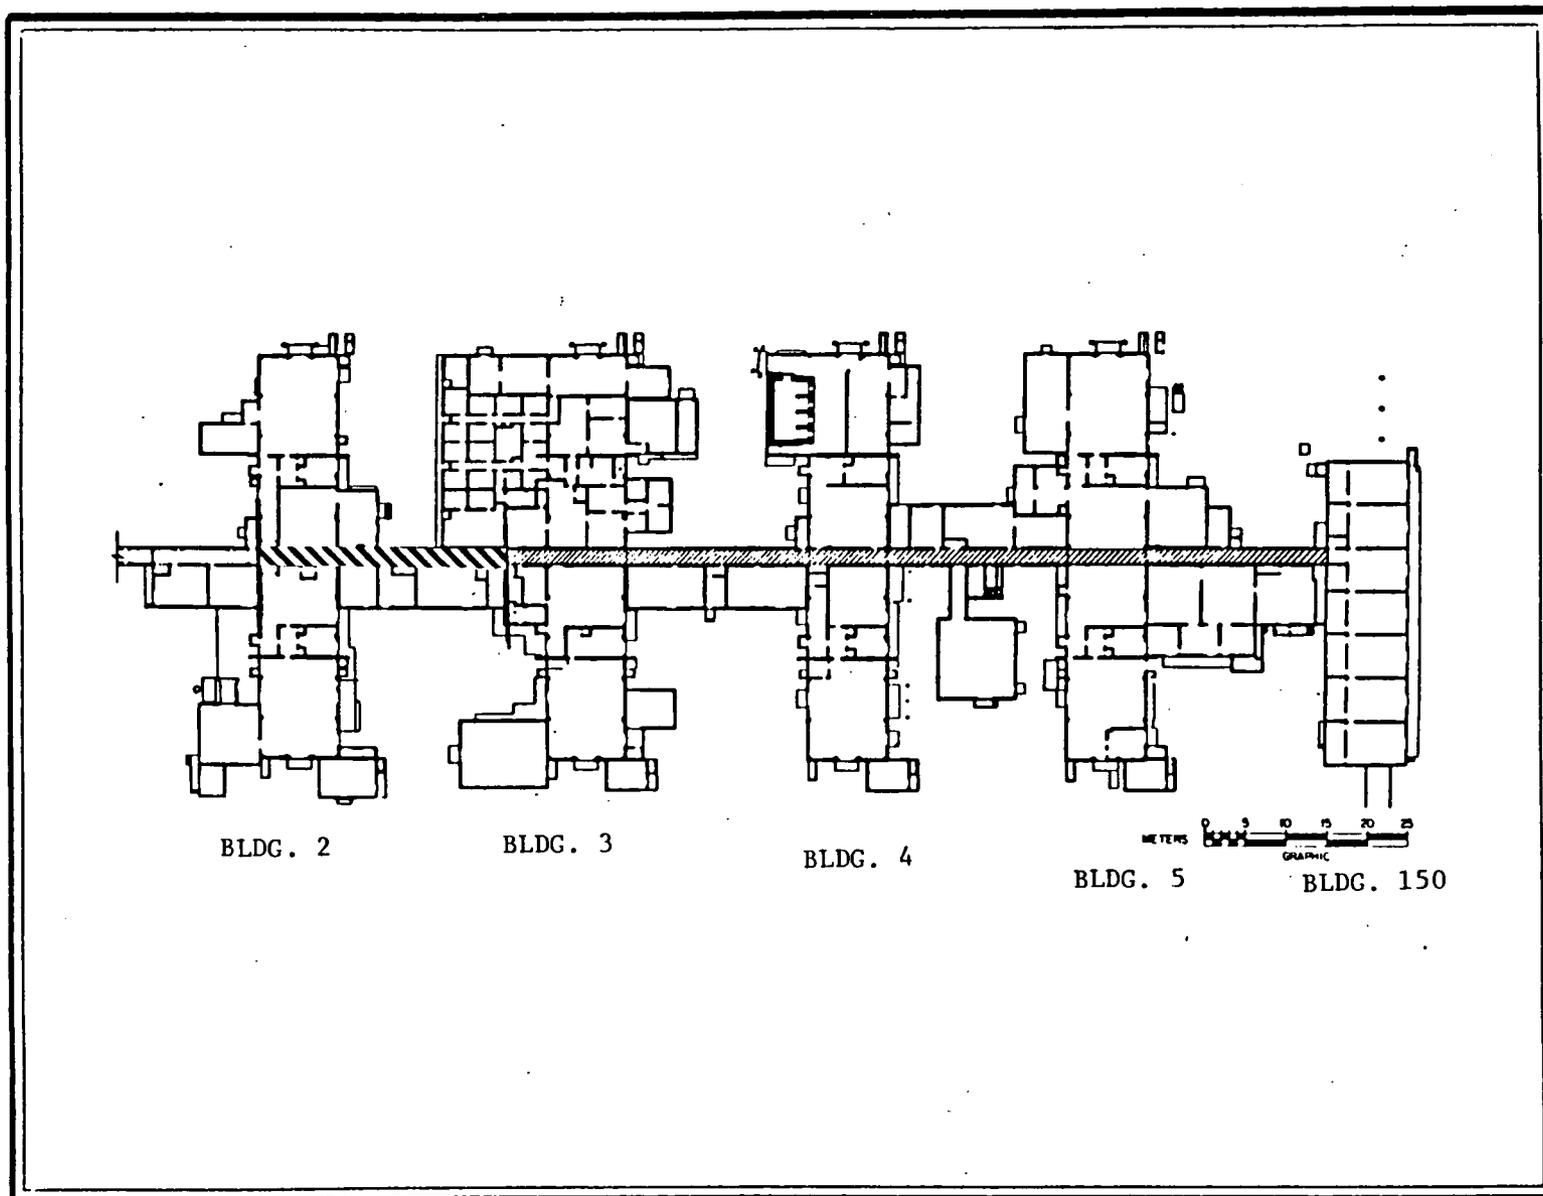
Overhead utility passageway decontaminated as part of Building 2.
